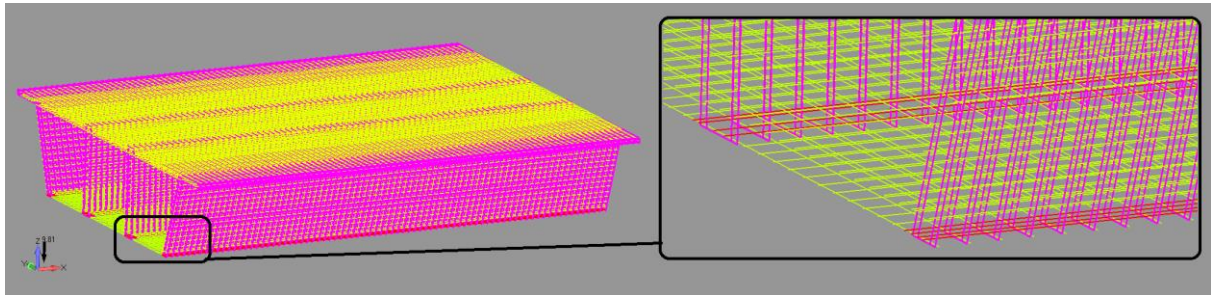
RC Bridge. Macro-element rebar mesh of the opening O4.
